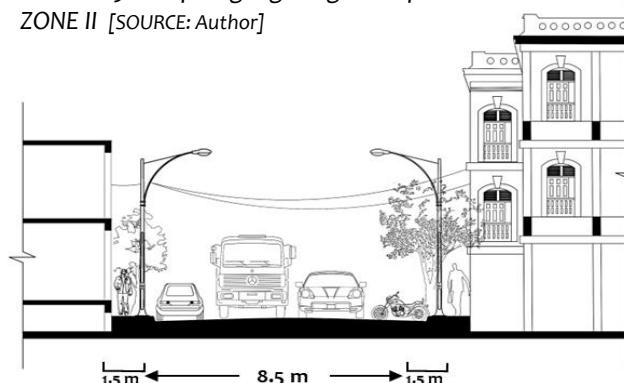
Section E-E' Through Bagbazar Street (Primary Road)
